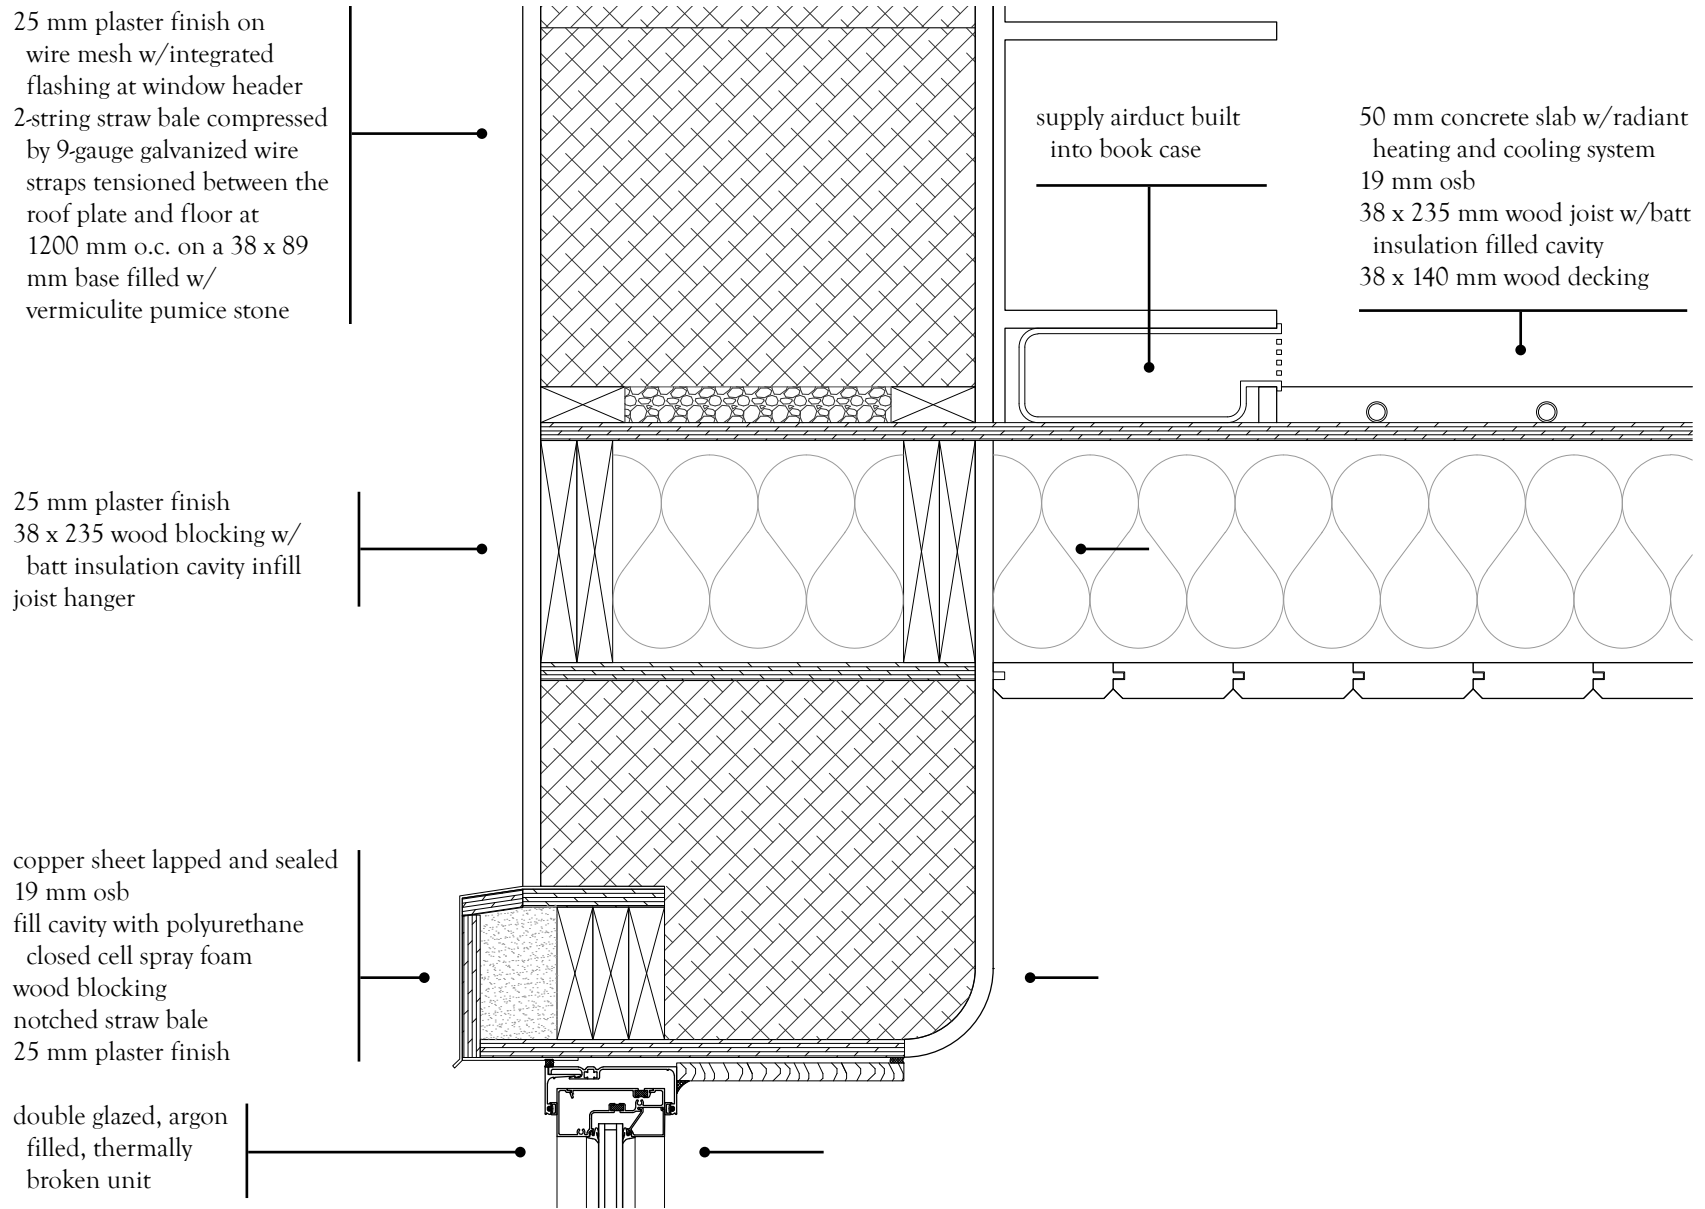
Detail H - Window header to straw bale wall to floor
